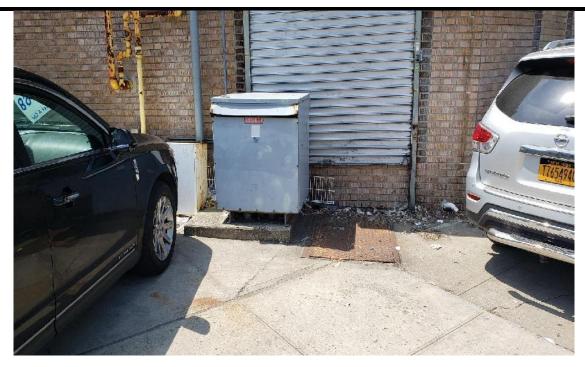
Transformer located along the eastern exterior wall of Building 1440.
